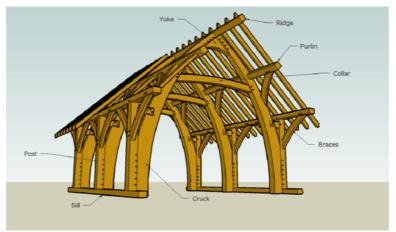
Timber Framing structural system [http://www.timberstructures.net/timber-framing.html]
